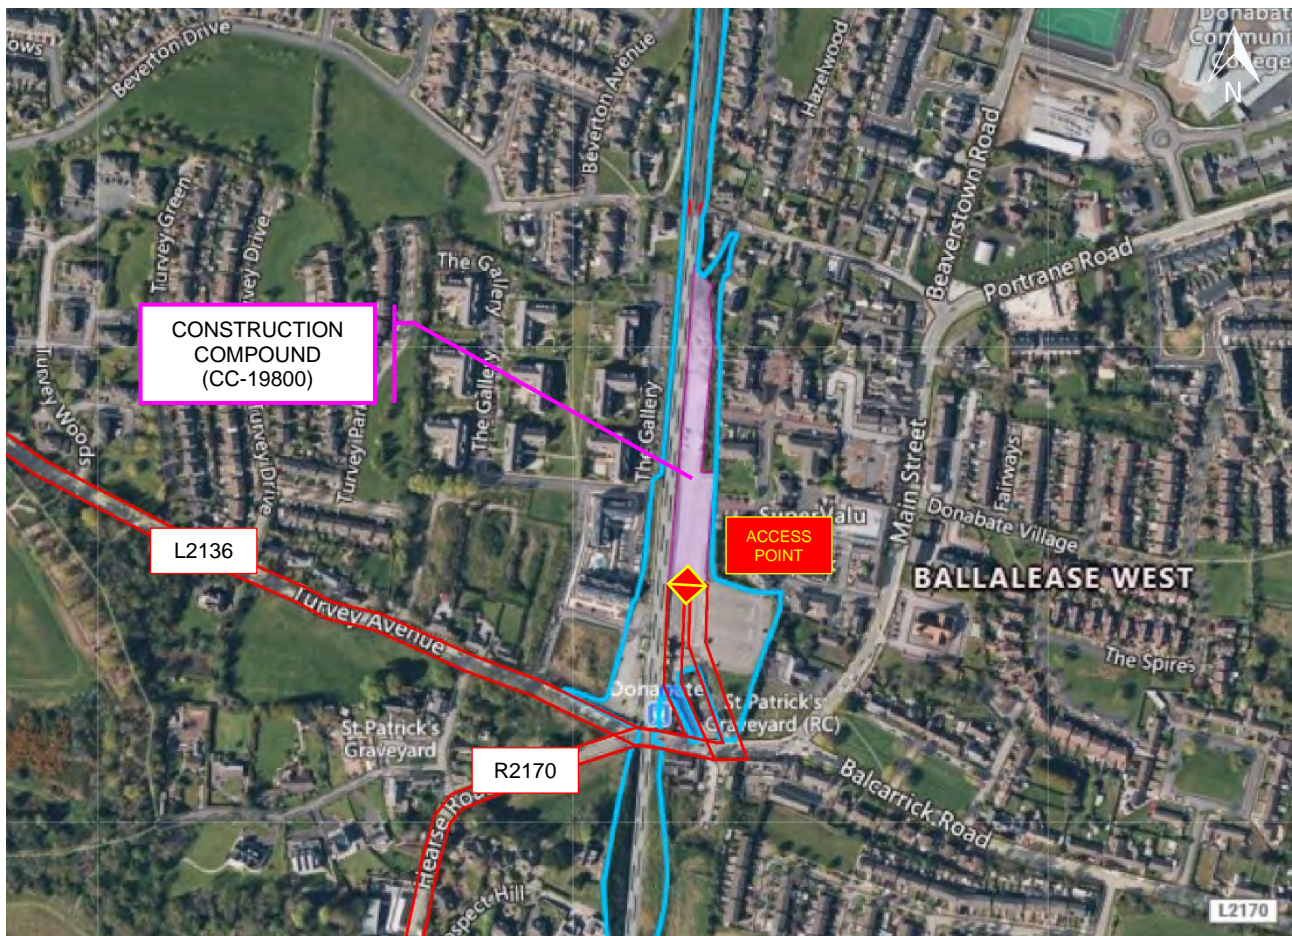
Donabate Station – Proposed Line-wide Construction Compound and Access Route (Source: ESRI)
